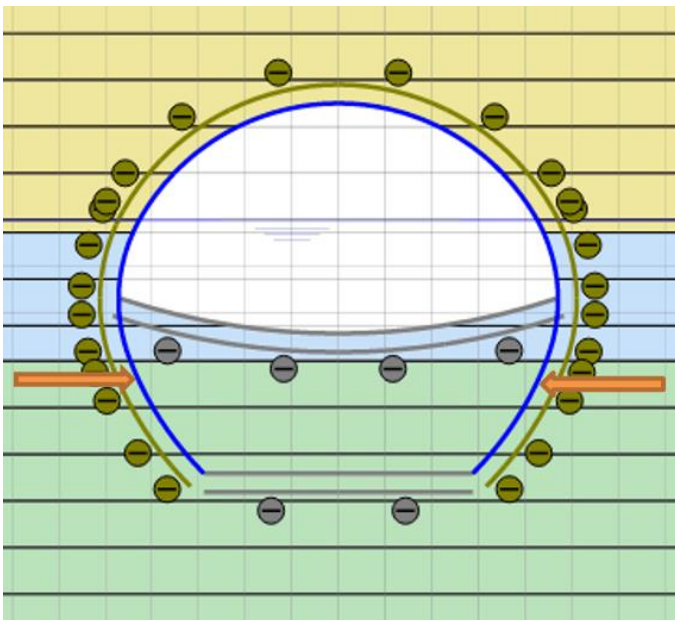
Orange Arrows Indicates the Liner in the Bench Soil Emulating the Steel Beams Acting as Footing of the Steel Ribs During Construction
